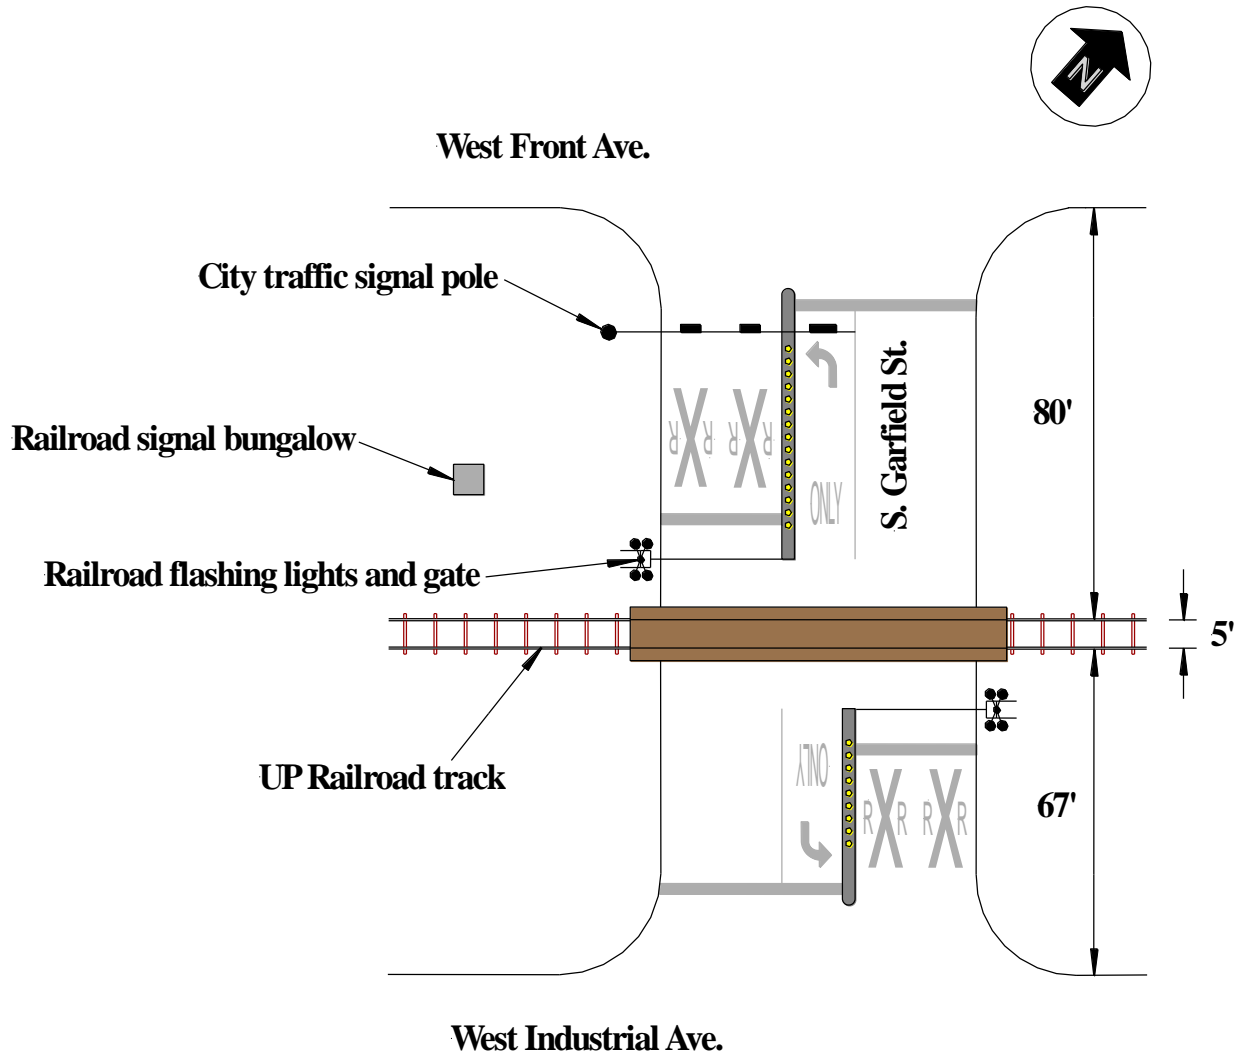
Layout of the South Garfield Street and Union Pacific Railroad grade crossing
